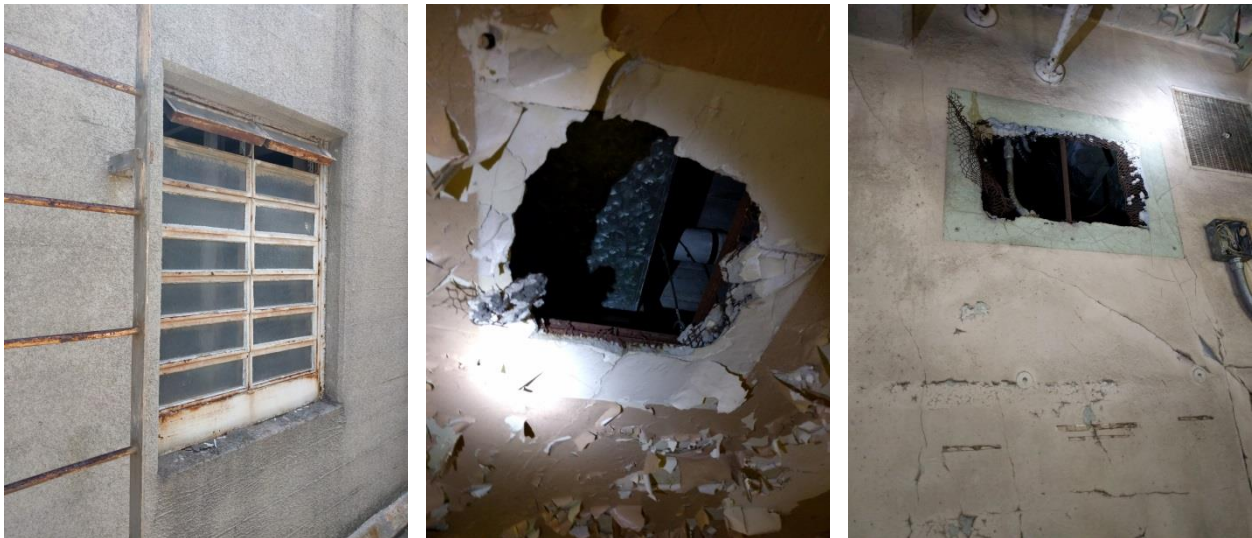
Examples of window openings and structural damage allowing access to bats.
